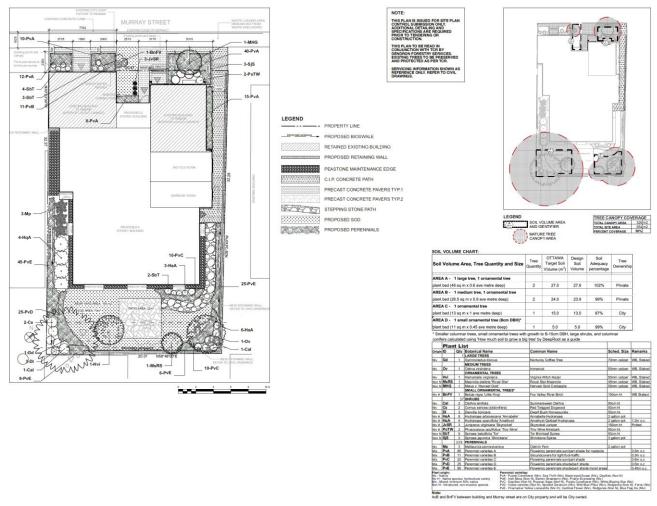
Landscape Plan Source: Rutland and Associates Landscape Architects 2025.
